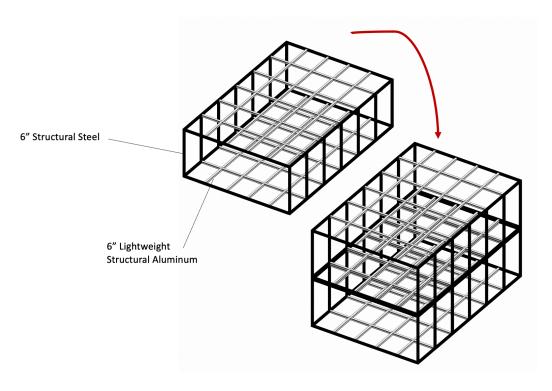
Structural Cage, created with Structural Steel and reinforced with Lightweight Structural Aluminum (Source: Author)
